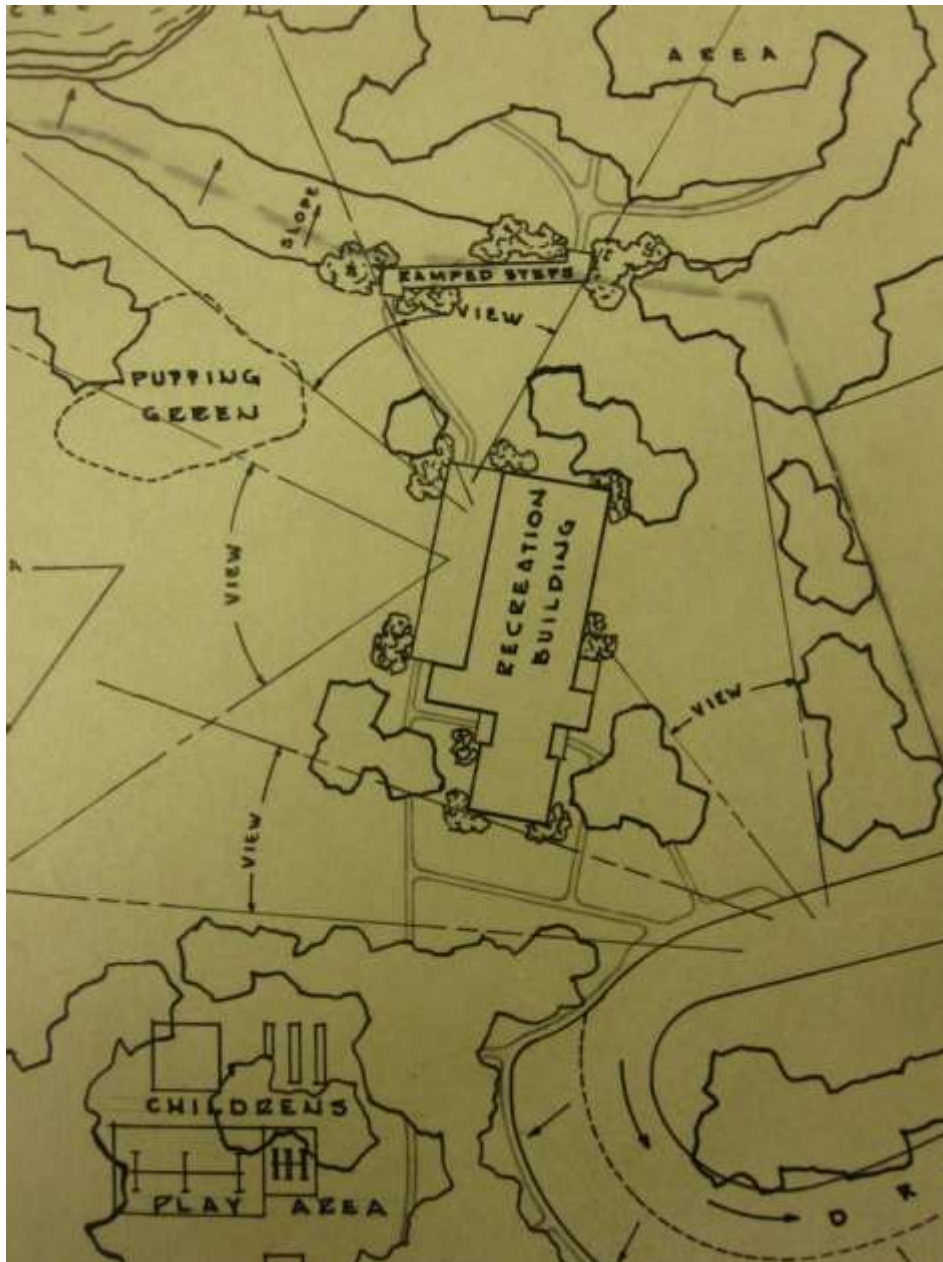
Detail of Veirs Mill Recreation Building in the 1954 Preliminary Development Plan.
